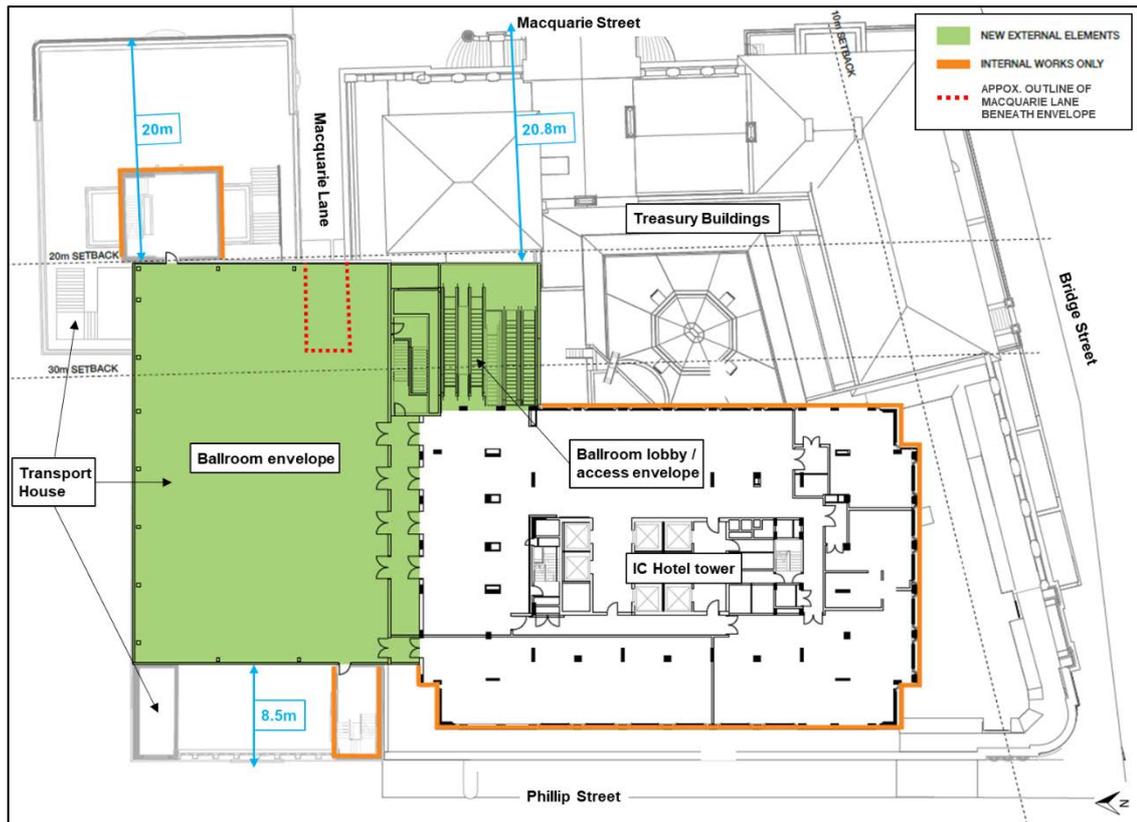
Transport House building envelope layout and setbacks (Base source: the Applicant’s Amended Concept)
